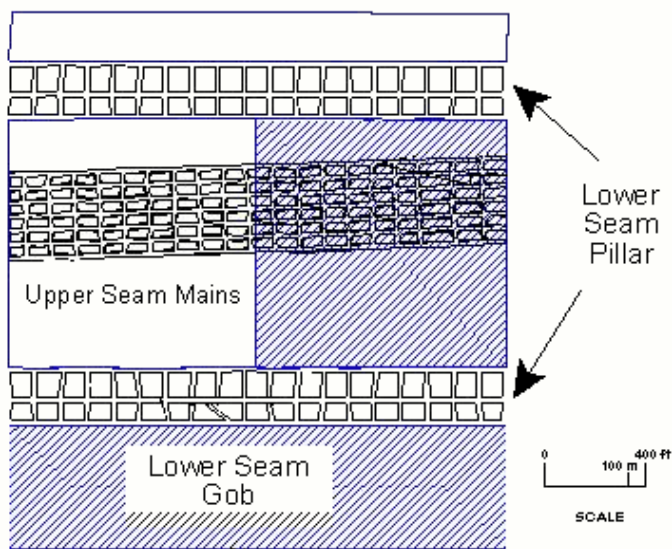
Longwall mining that subsided open entries 560 ft (170 m) above.
